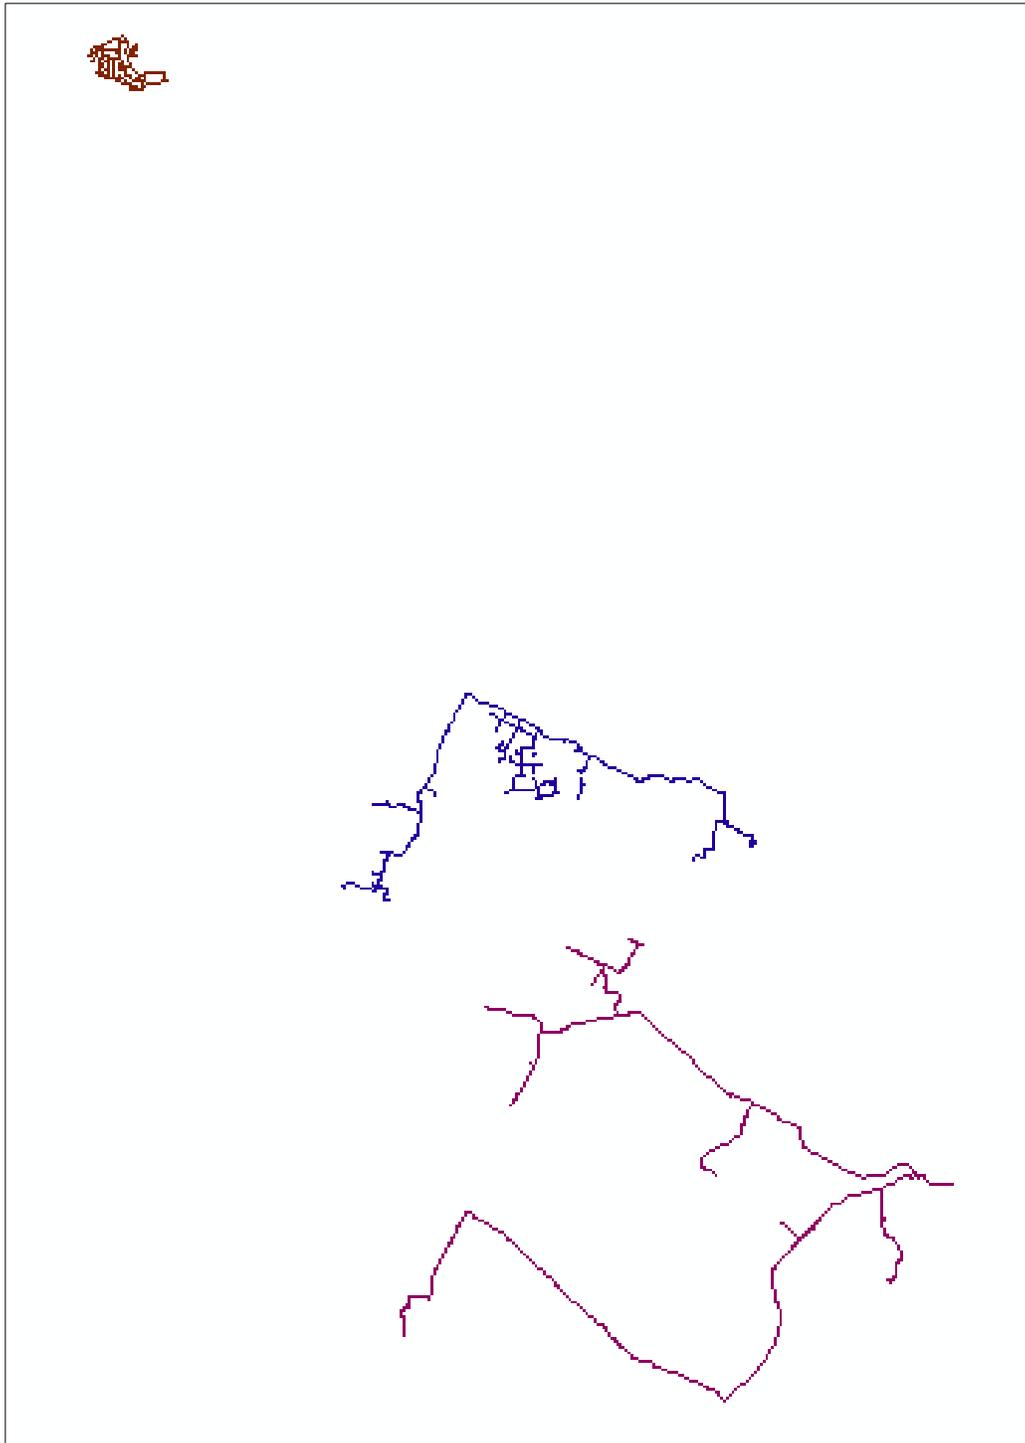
a. Reclaimed Network. From Top to Bottom, Section 3, Section 2, Section 1. <sup>12</sup>
